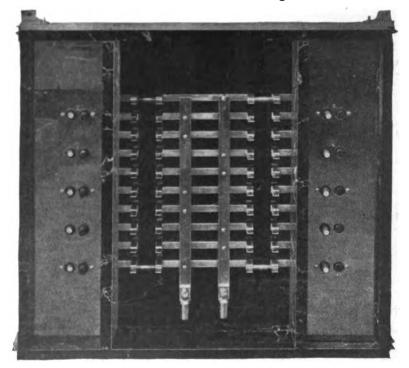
Cut-Out Panel with Push-Button Switches. Cover Removed.
